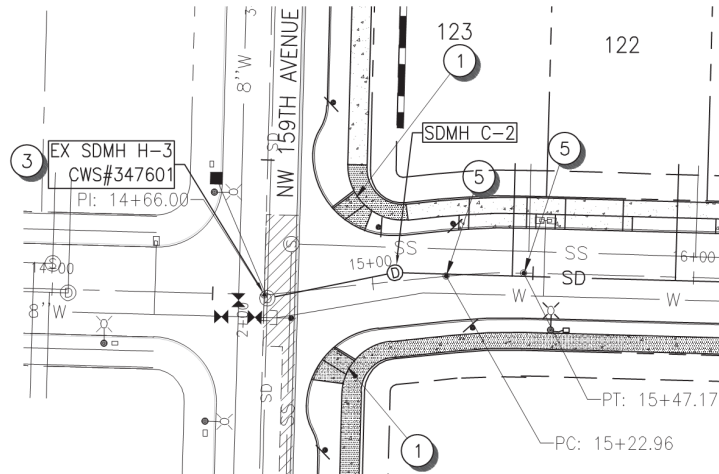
A portion of a street and storm drain plan with key notes in a legend used to link specific notes to features in the drawing.
